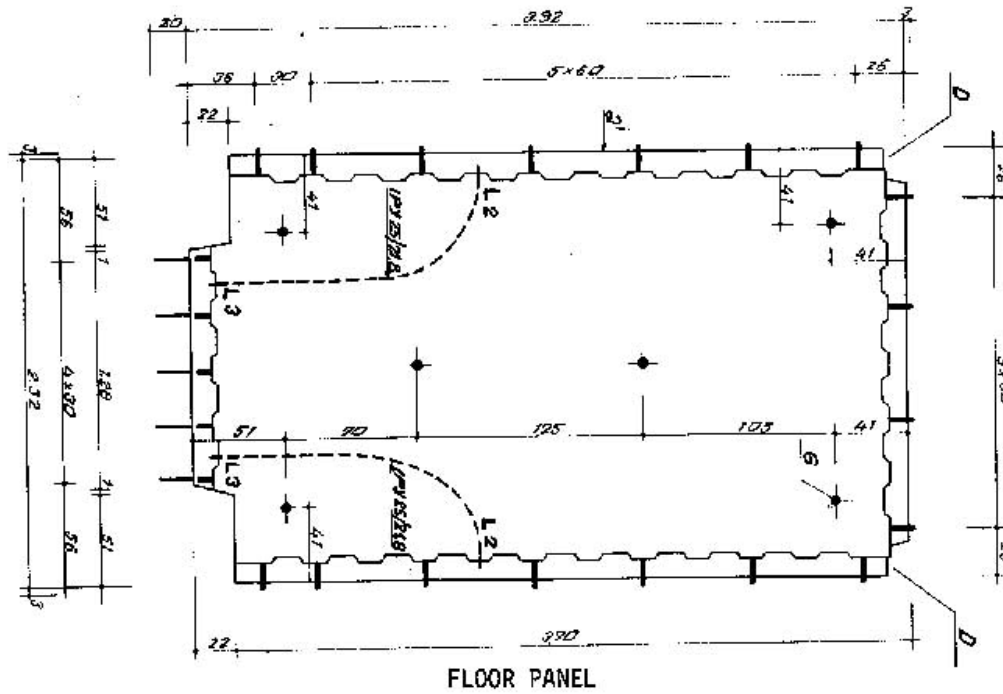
Floor panel and horizontal joint details (NBS 1977)
